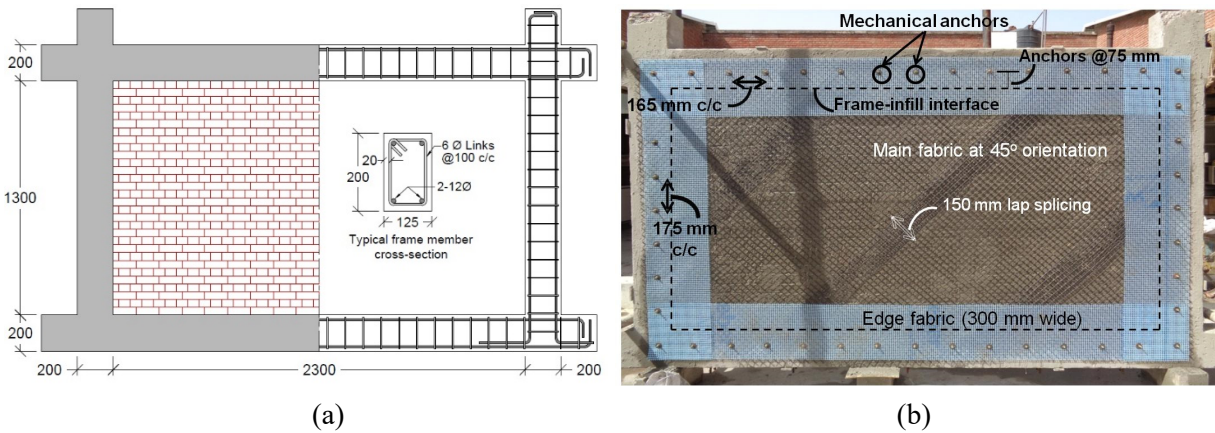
Test specimen: (a) Geometric and reinforcement details, (b) Layout of FRCM strengthening of specimen DA₄₅
